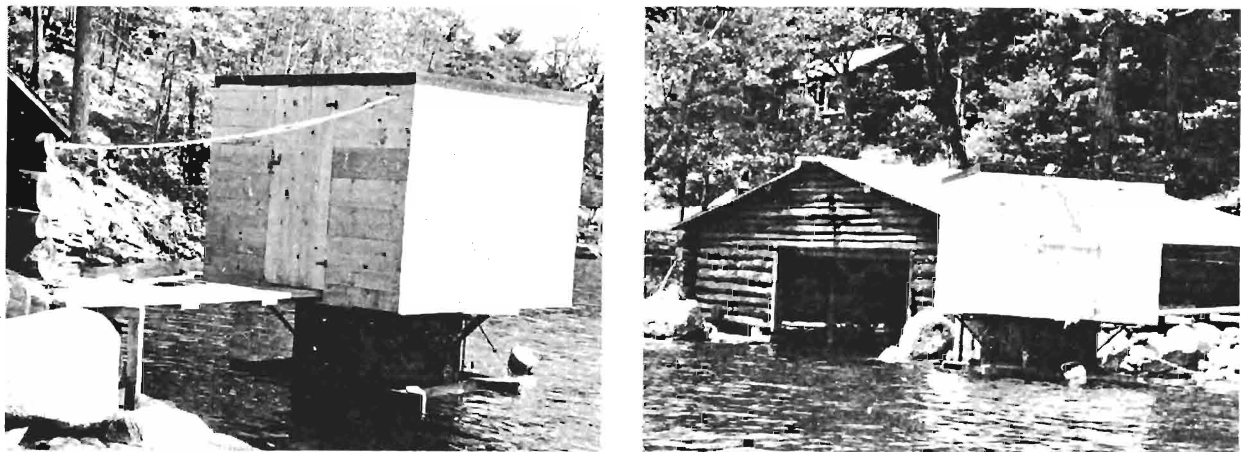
First underwater tower at Diamond Island, 1961.
